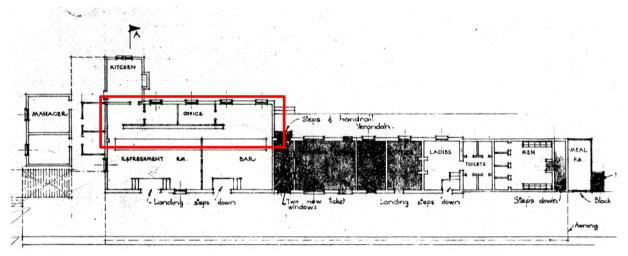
Plan of Platform 3 Station Building with proposed layout to be implemented during electrification works. Approved 19 January 1954. Source: Sydney Trains Plan Room CV0053352. Approximate area of works highlighted. Note: Kitchen since has been demolished.
